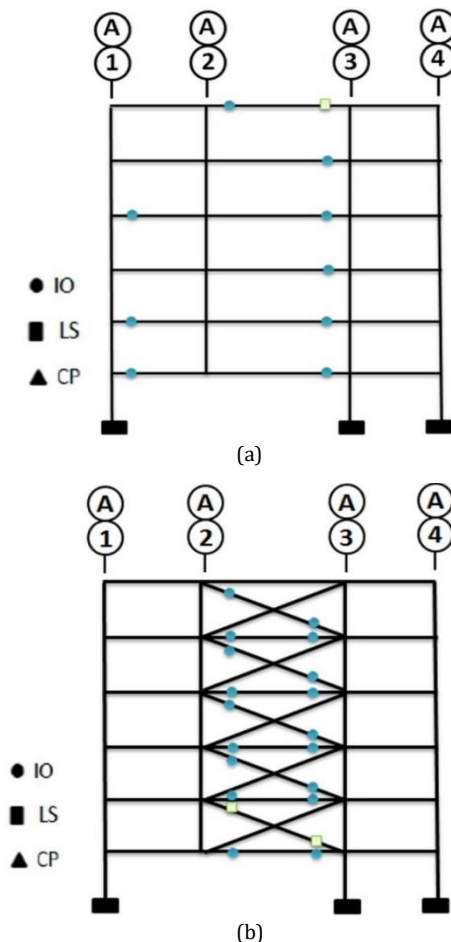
Plastic hinge formation with the removal of column 6, a) moment-resisting frame without bracing elements, b) compound steel braced moment frame, in accordance with UFC-4-023-03 (2009) design criterion.
